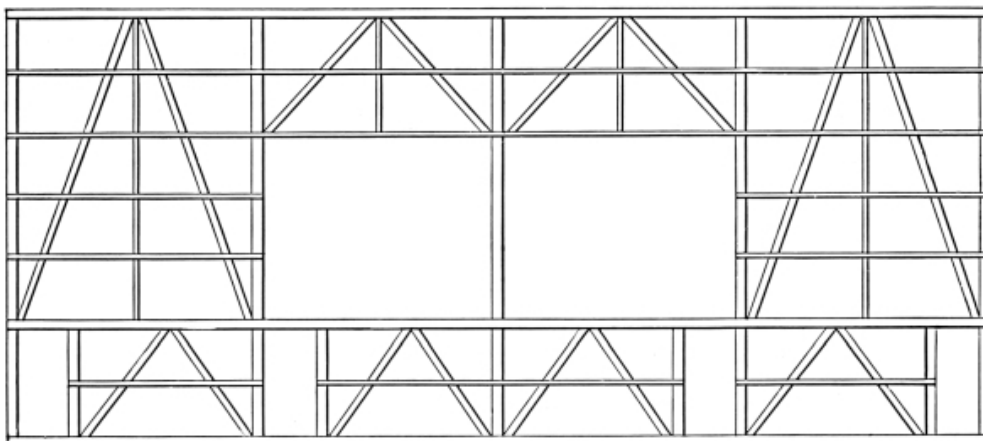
Side View of Plank Frame Barn.—Scale, 3-32 Inch to the Foot.
